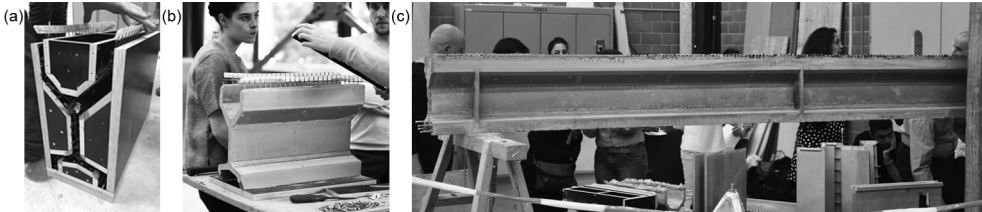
X-beam: (a) timber formwork; (b) segment; (c) full-scale member.
